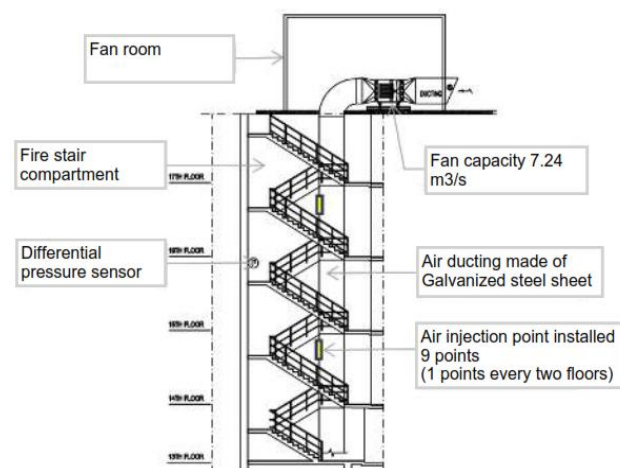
Layout of pressurized system design for fire stairs WTC 6 building.
